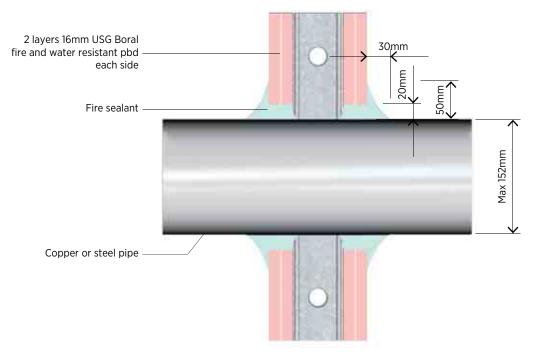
Penetration Detail - Copper/Steel Pipe - Single Stud - FRL 120/120/-
